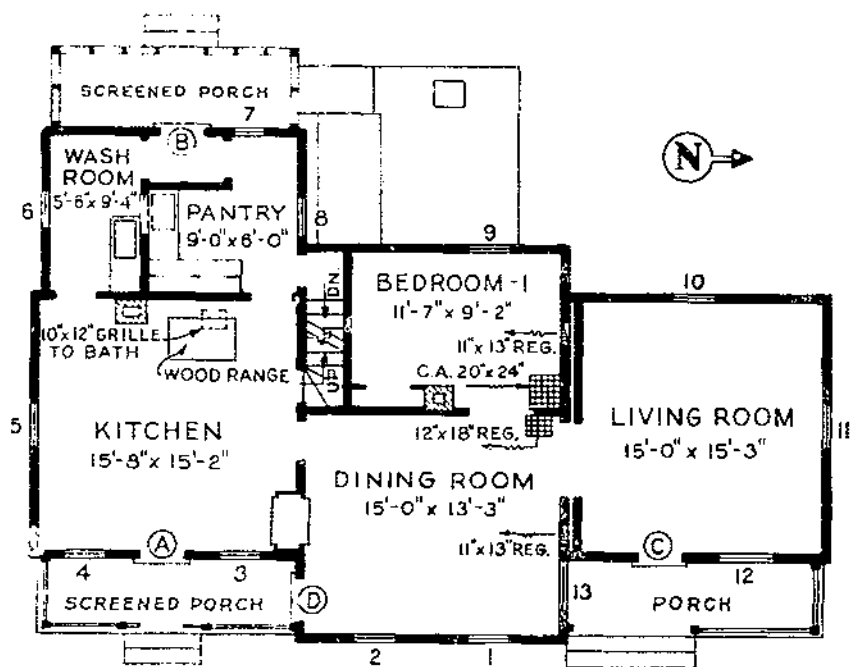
First floor plan of house No. 3, showing location of warm-air registers and cold-air returns.
